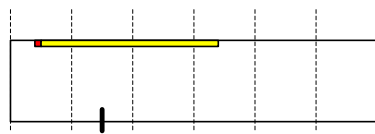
Location of the final failure mode of test girder 6, 600x80
